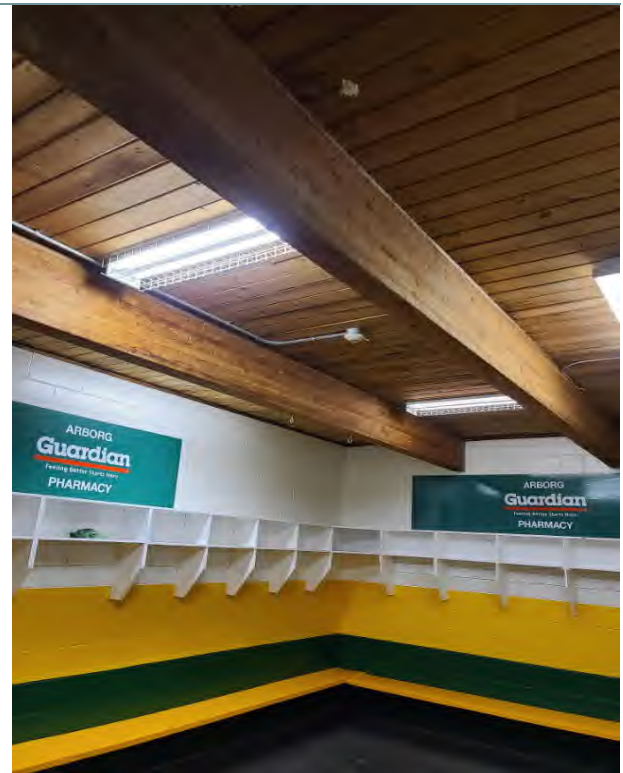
Glulam wood beam and ceiling in the locker room addition to the Arena
